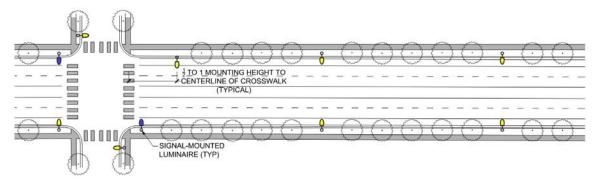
Typical Arterial with Continuous Street Lighting Plan
